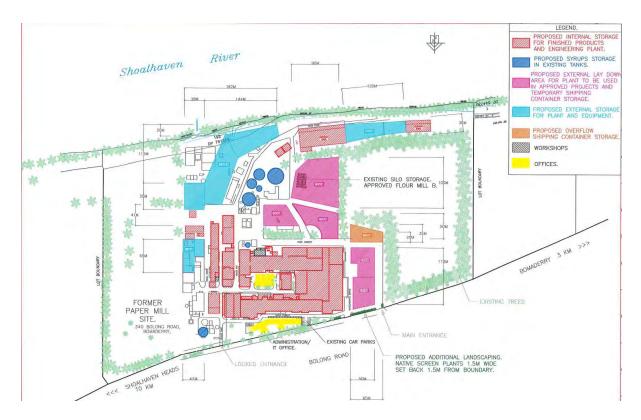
Proposed modifications to the Australian Paper Mill site (source: Manildra).
